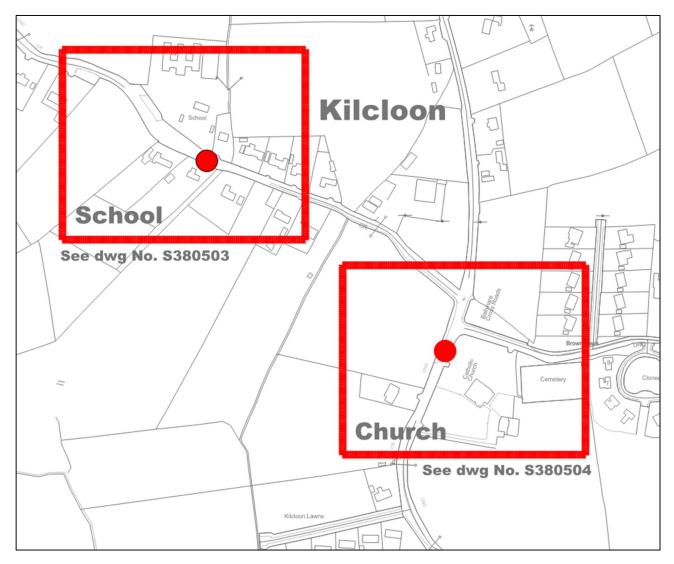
Proposed Site Location of Kilcloon Traffic Calming Scheme
